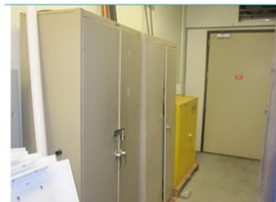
South wall of lower level mechanical room, location of two new reduced pressure backflow preventers
